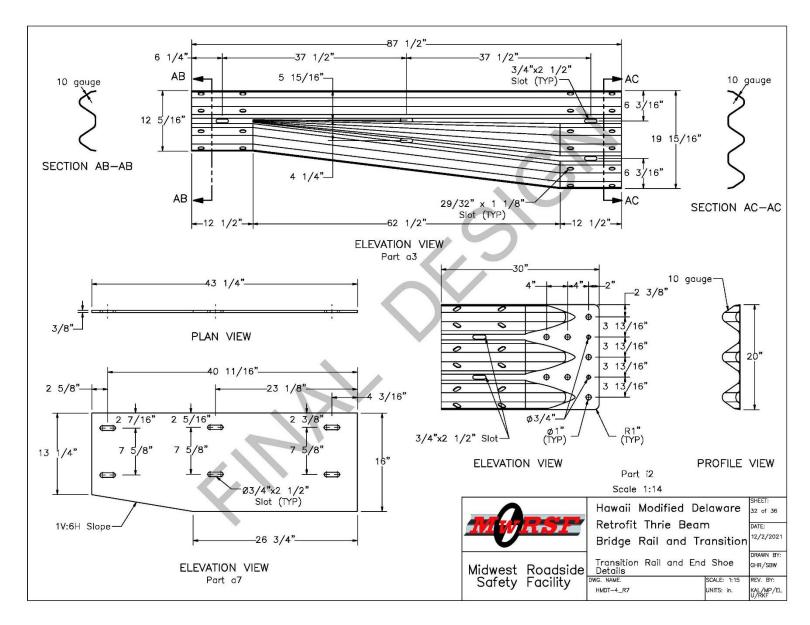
Transition Rail and End Shoe Details, Test No. HMDT-4
